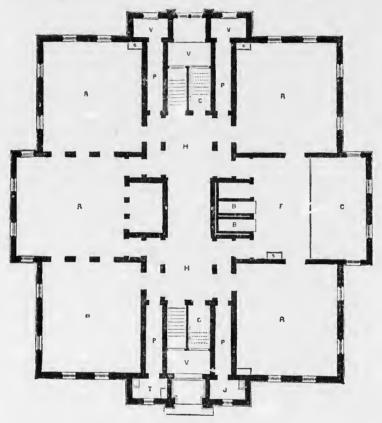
BASEMENT PLAN, ADAPTED TO FIG. 170.
